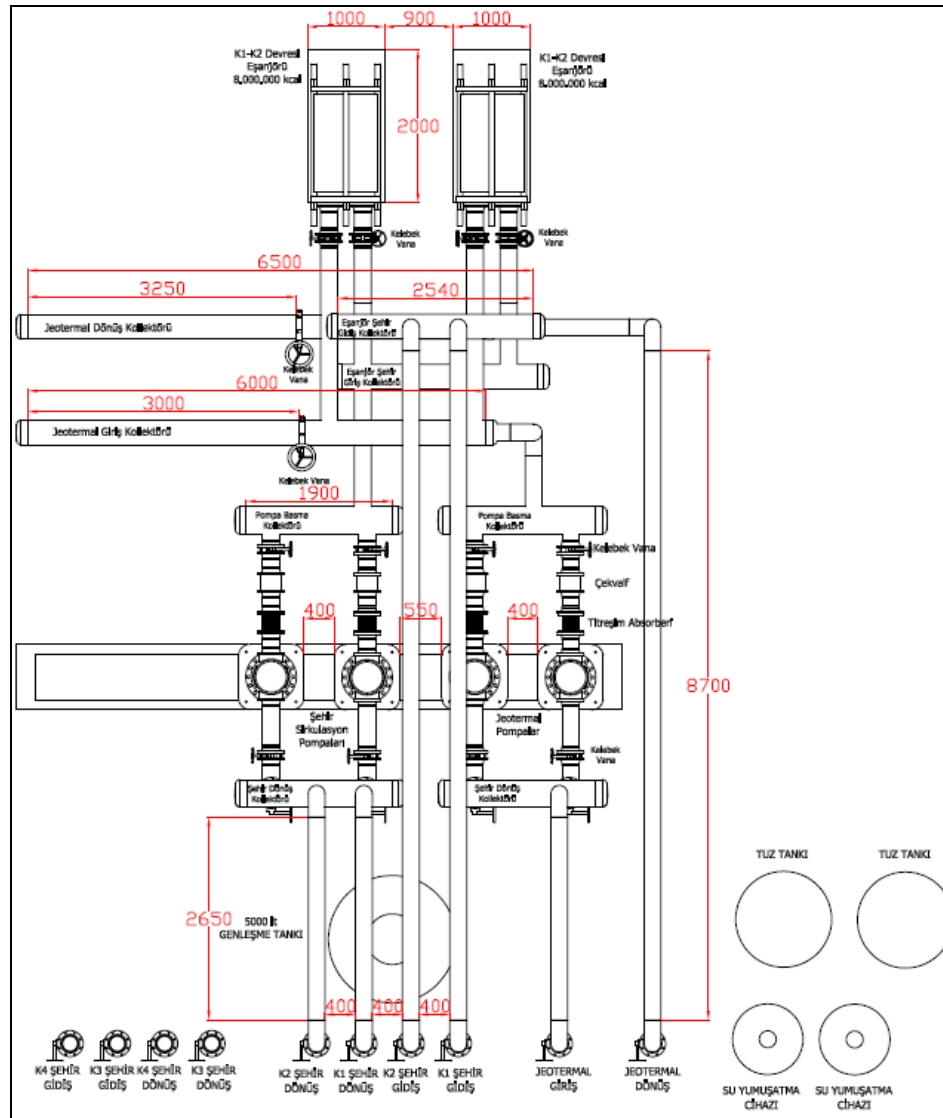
Residential plan of Yenikale heat center (IBGE Inc., 2009).
